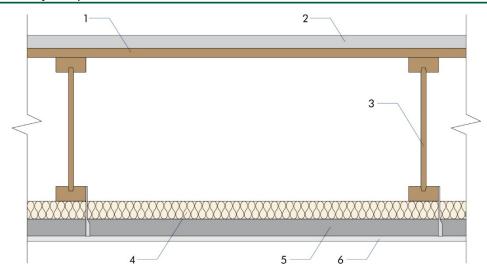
ONE-HOUR FIRE-RESISTANCE-RATED FLOOR-CEILING ASSEMBLY (Ceiling—one layer of ½-inch or ⁵/₈-inch gypsum wallboard, attached to furring channels spaced 24 inches on center)
